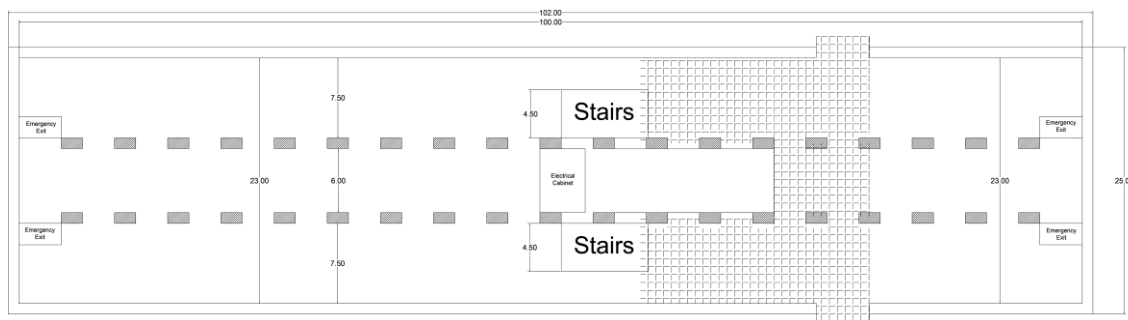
Plan of Naghshe_e Jahan Metro Station
